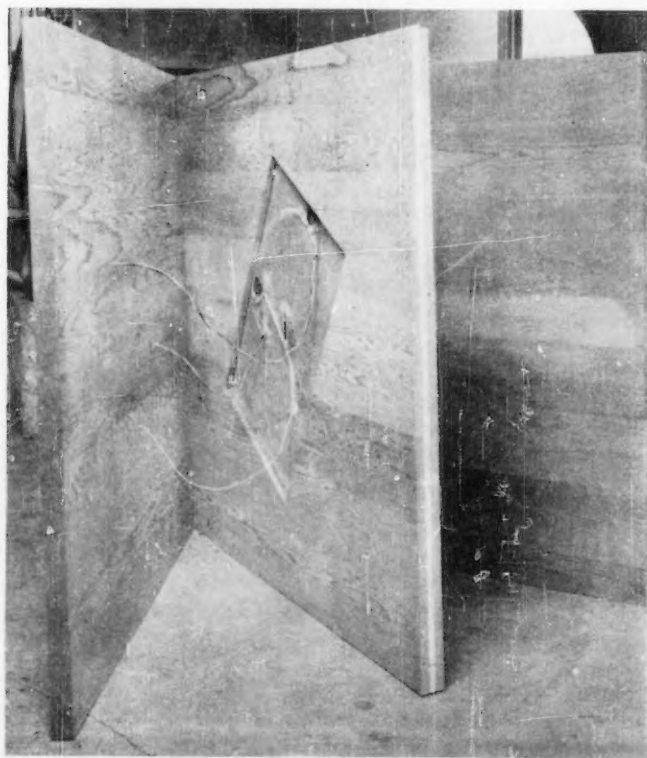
Sandwich Panel Before Assembly for Test in Combined Edgewise Shear and Compression.
